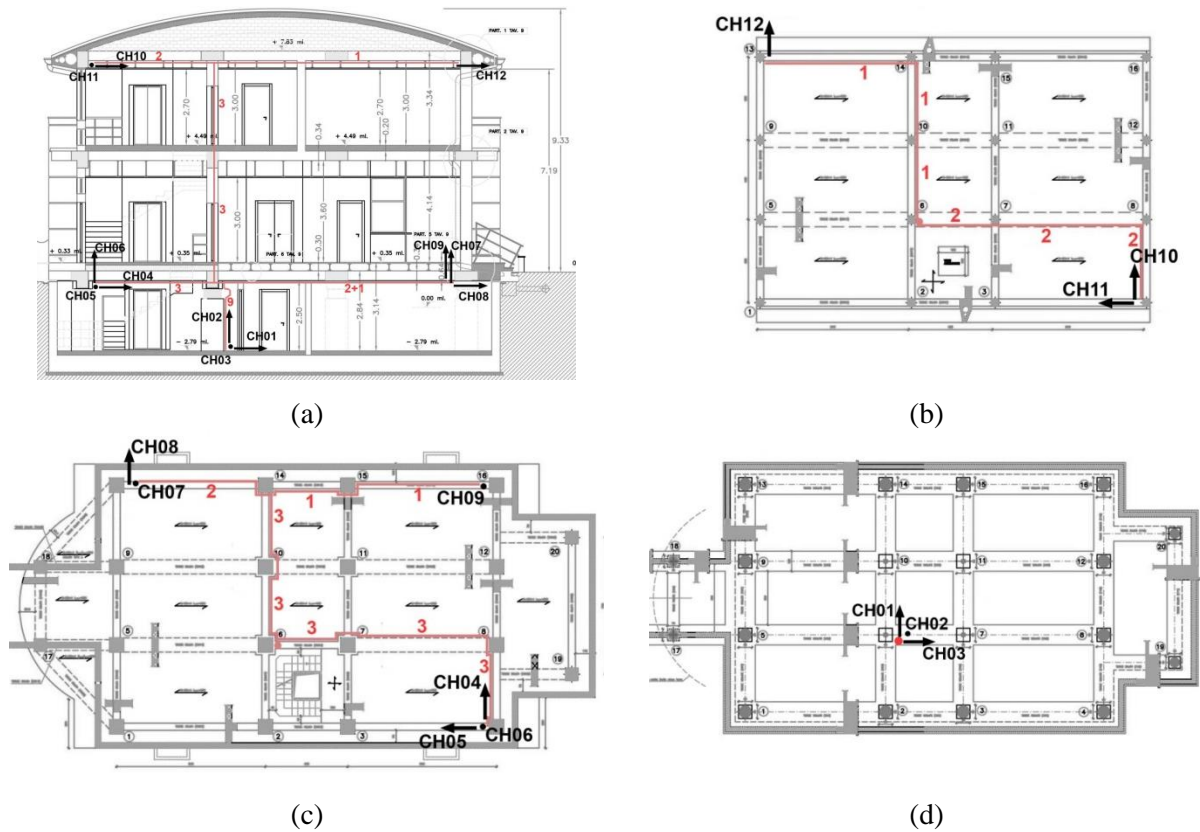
Sensor deployment in the Forestry Building at Foligno: (a) vertical section, (b) top floor, (c) first floor above the isolation interface, (d) basement.
